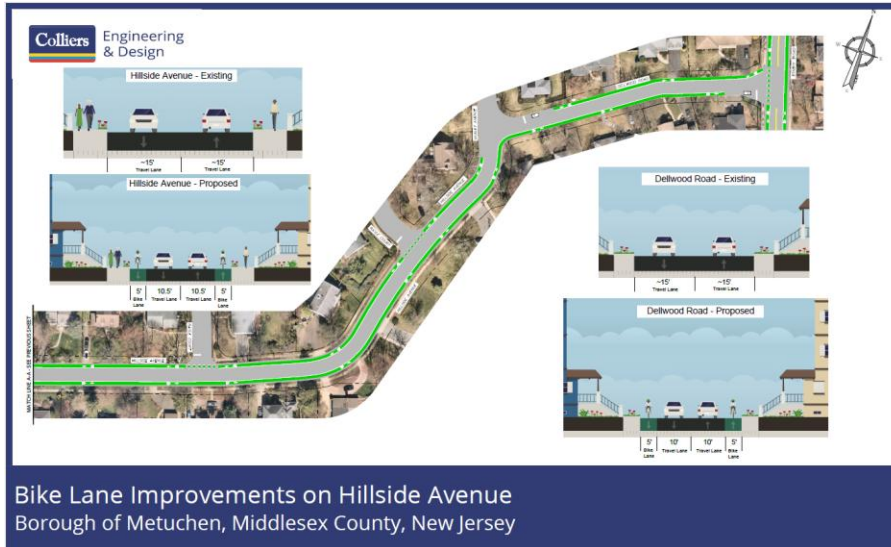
Dellwood Road and Hillside Avenue Cross Section Diagrams and Pavement Marking Concepts by Colliers Engineering & Design.
